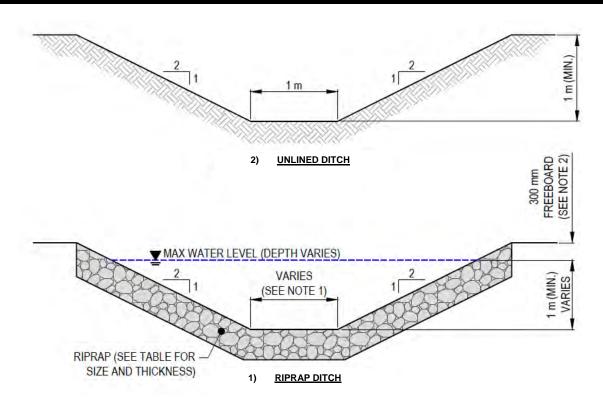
Erosion Control BMP - Sections and Details - Sheet 2 of 2
